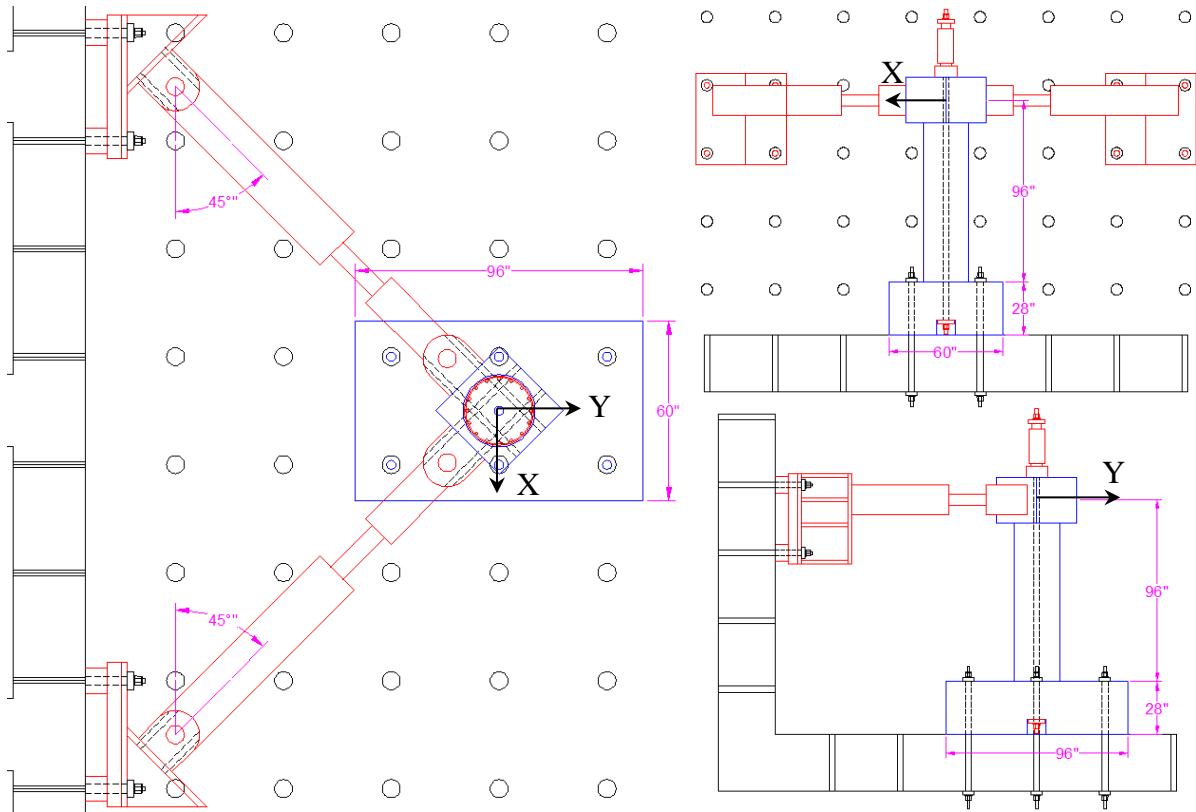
Sample Test Setup and Positioning on the Lab Strong Wall and Floor
